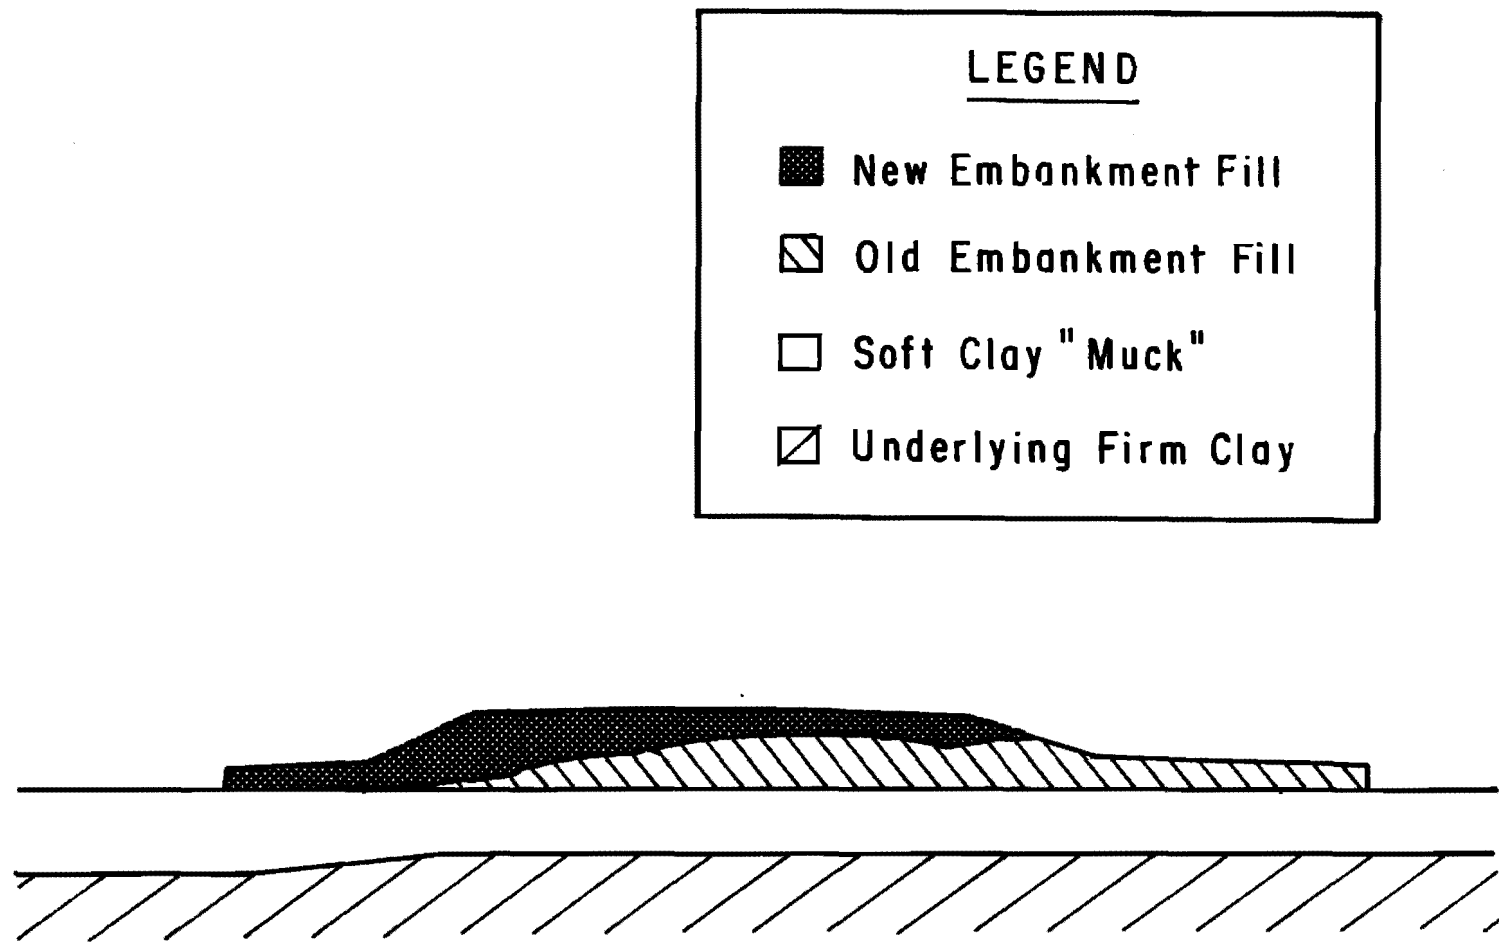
Planned cross-section of completed Oso Bay embankment.
